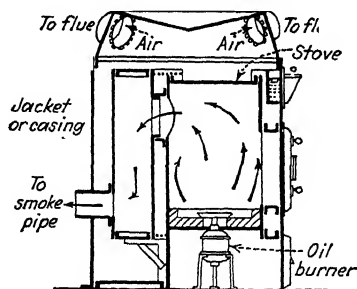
Welded steel warm-air heater with oil burner.
